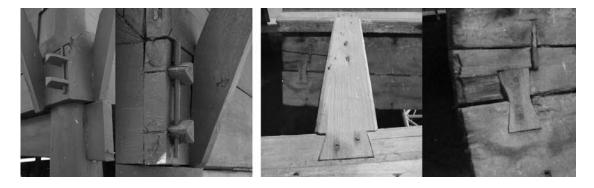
Butterfly and dovetail joints in traditional Thai joinery From left to right; dovetail and butterfly joints were commonly employed for joining the structural elements of vernacular Thai house as well as constructing the wooden components of ceremonial Thai barges. (Kongsuwan 2009)
